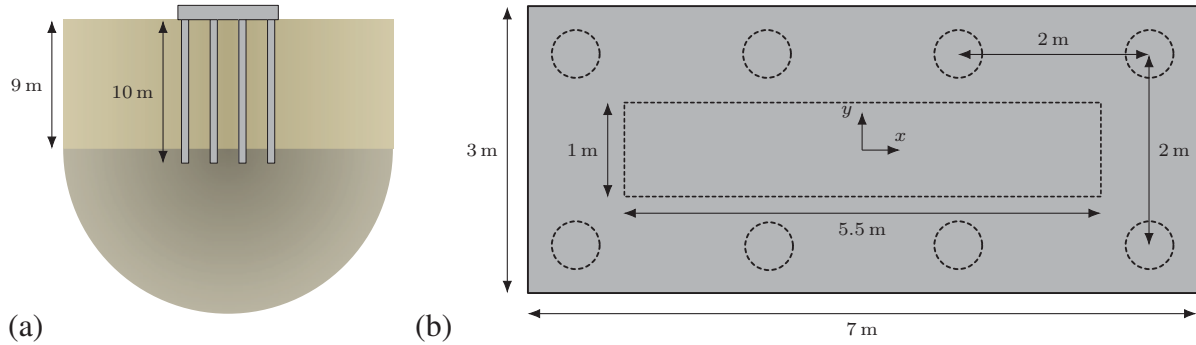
(a) Piled foundation embedded in a horizontally layered halfspace and (b) geometry of the piled foundation.
